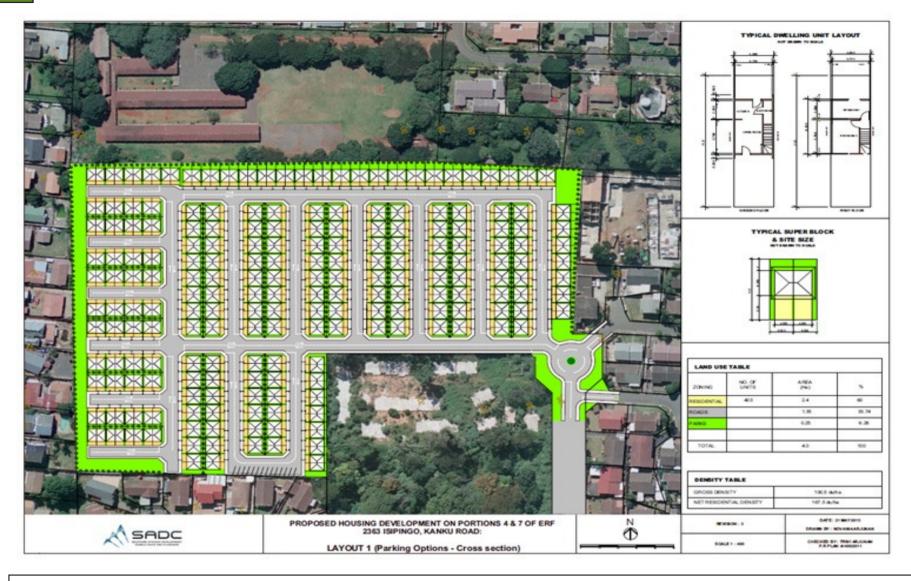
Layout Plan of the proposed Housing Development on Portions 4 and 7 of Erf 2363, Isipingo, Kanku Road.
